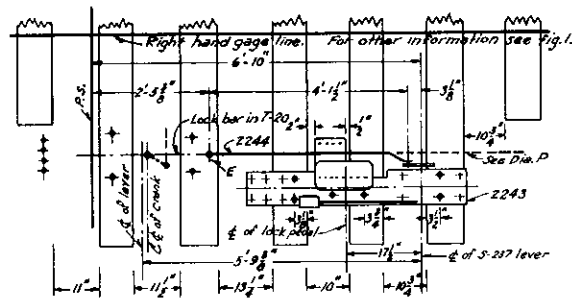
R.H. LAYOUT 18 FT. SWITCH RAIL - 2 HOLE 100 LB. & 130 LB. RAIL.
